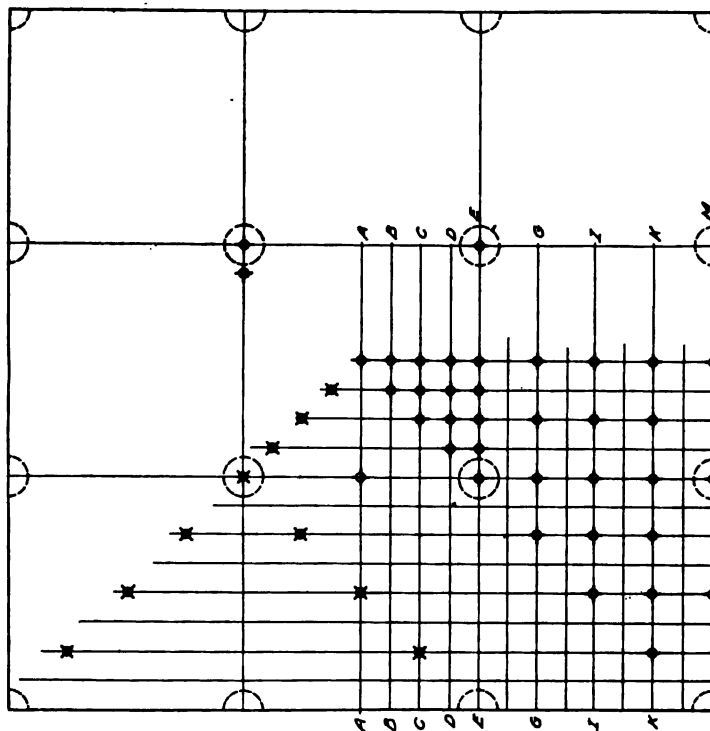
ARRANGEMENT OF EXTENSOMETERS
